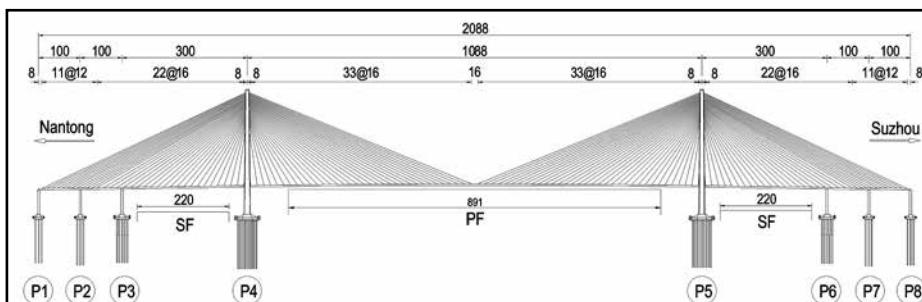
Span Arrangement for SuTong Bridge – China (unit: m)
